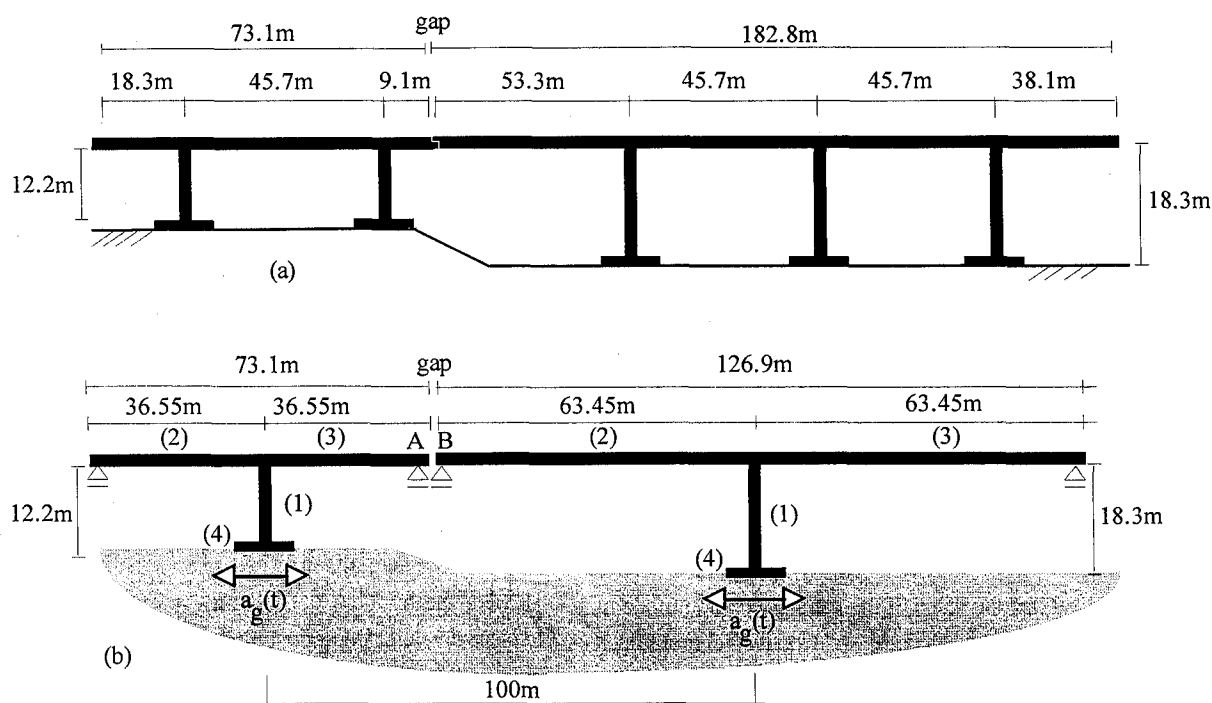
(a) and (b). Idealization of a two-adjacent-frame bridge. (a) Bridge with multiple-pier frames and (b) Single-pier frame bridge with subsoil
